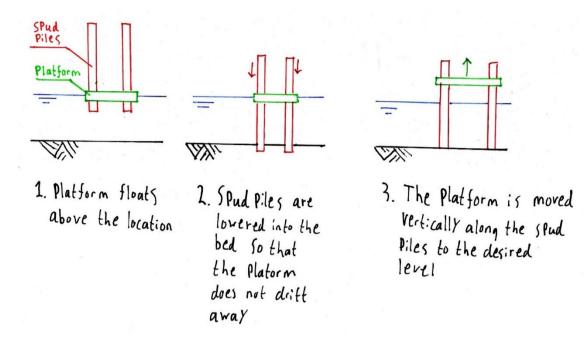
The mechanism of a jack-up barge with spud piles, schematised (NTS)
